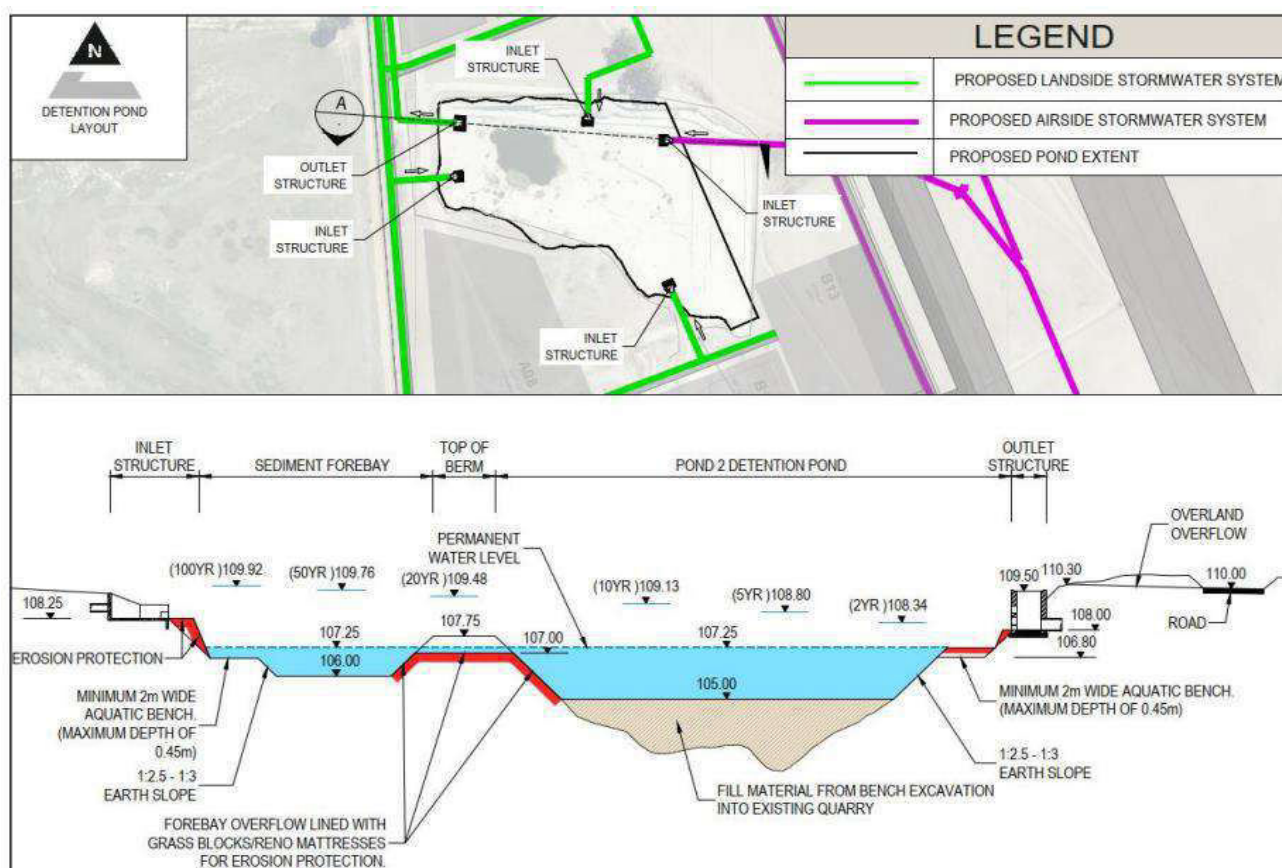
Typical Cross section of the Wet Detention Pond (Zutari, Concept Stormwater Management Plan, August 2024).
